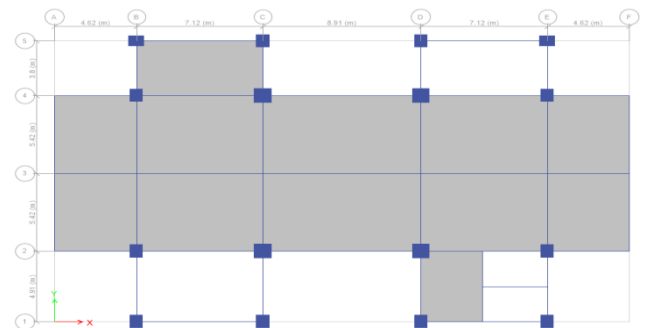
(a): Typical Plan view of Building model with Floating Column for stiff, medium stiff and soft soil
